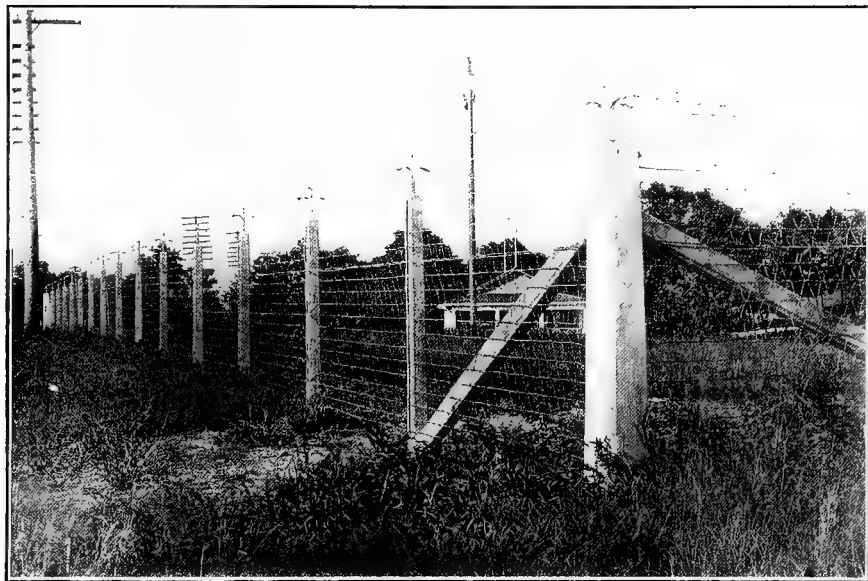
CONCRETE POSTS AT DELLWOOD PARK, JOLIET, ILL.
